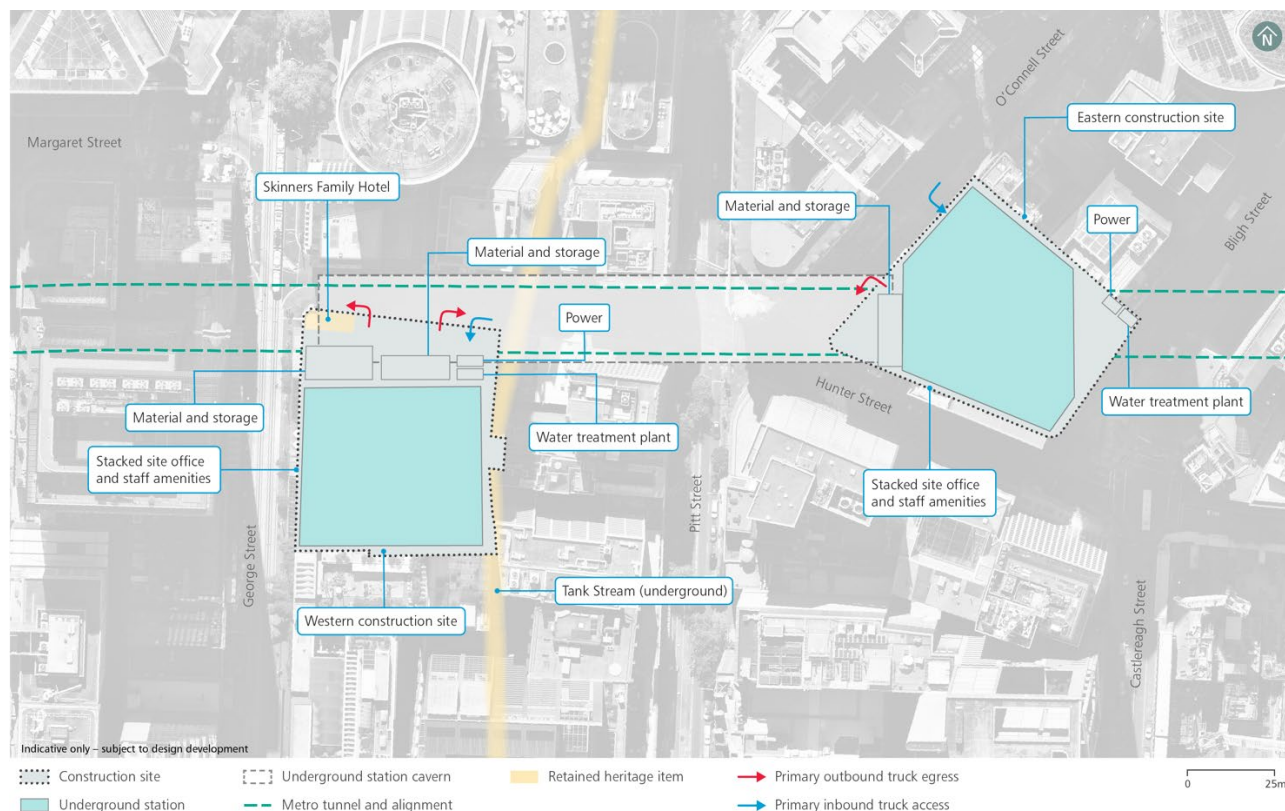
Hunter Street Station (Sydney CBD) indicative construction site layout
